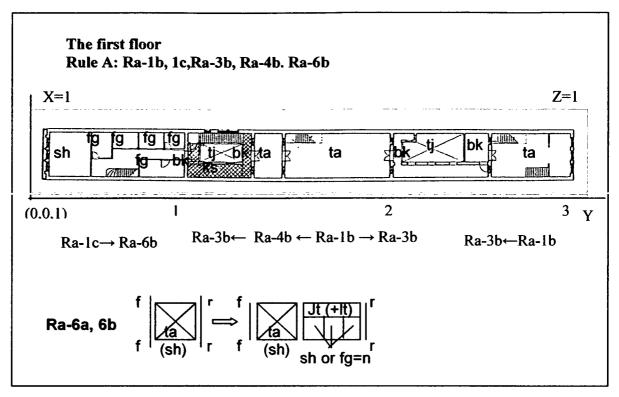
8 Rule A for the first floor at No. 71 Dihwa St
